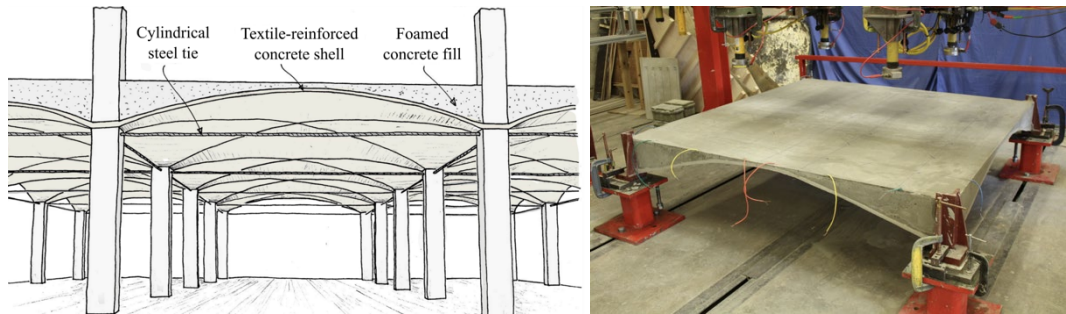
Hawking's vaulted floor system conceptual design and built prototype (Hawkins, 2020)
